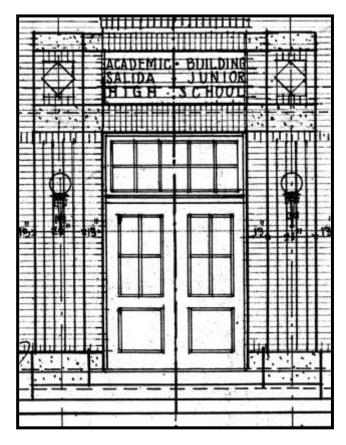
Drawing of original entry doors, Kesner Junior High School, Salida.
